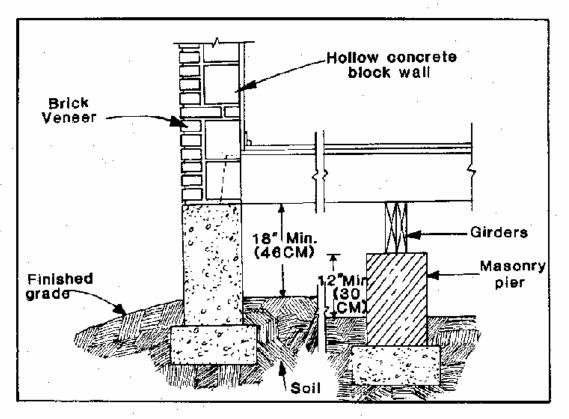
Proper Construction Where the Building Superstructure is Masonry. (Adequate clearance should be provided between wood and soil both inside and outside the building).
